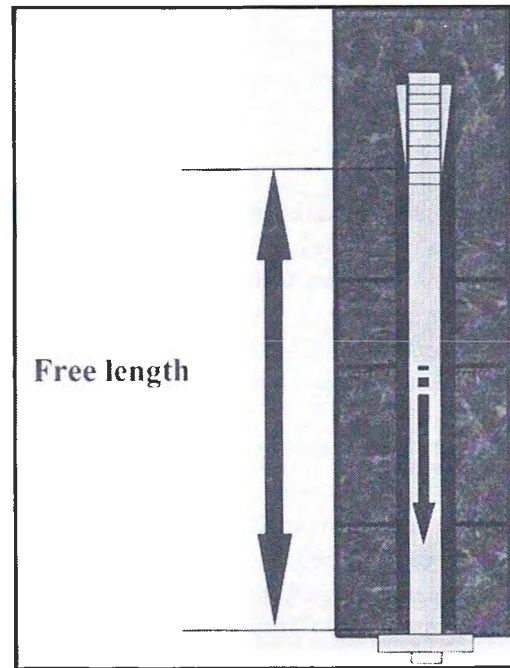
The free length of a point-anchor roof bolt affects its stiffness.
